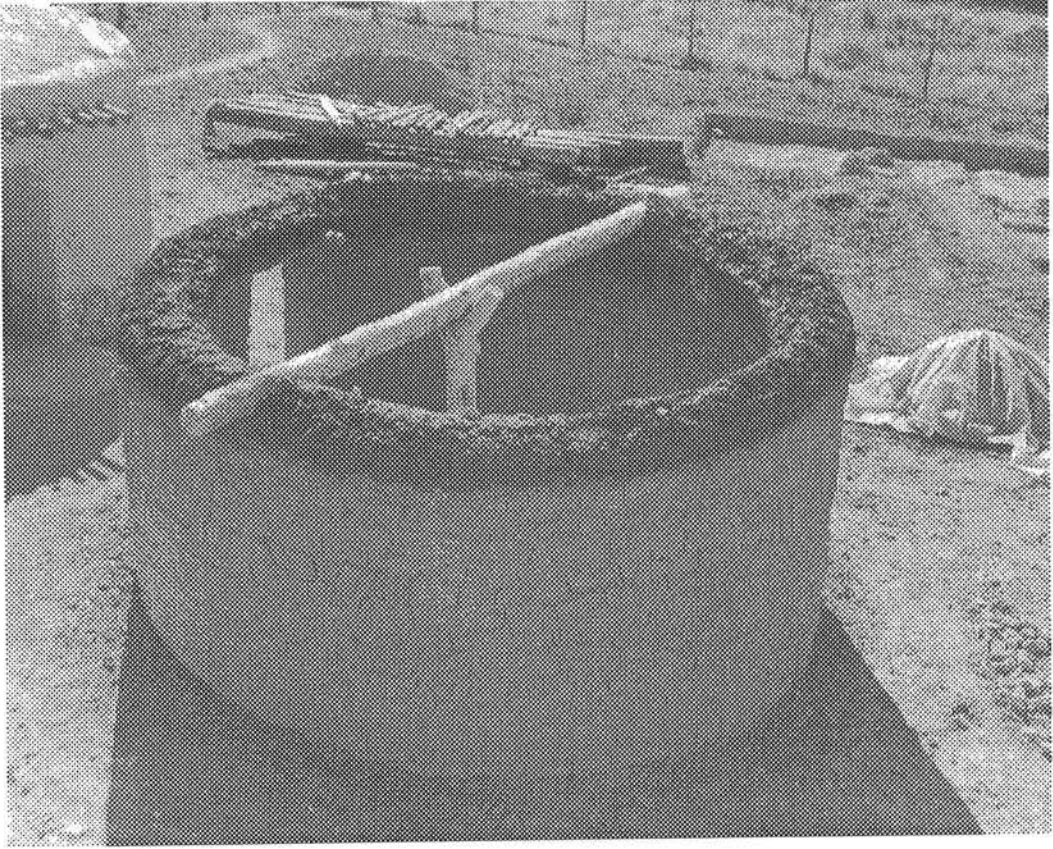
LEV, RH3 the finished wall with the timber upright and ridge pole in place.
